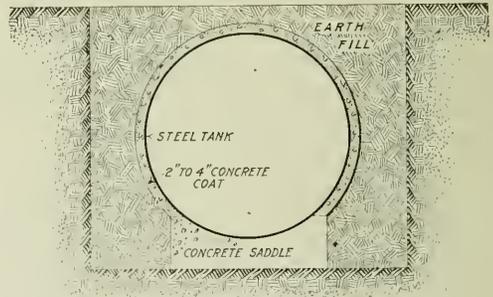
PROTECTING A BURIED STEEL STORAGE TANK
